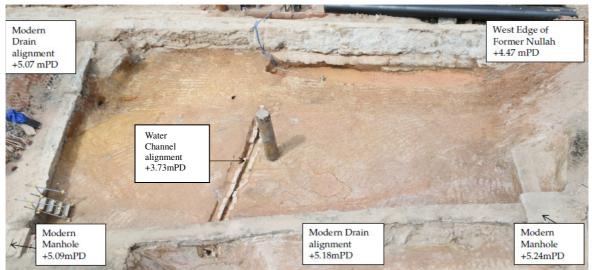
Modern manholes and modern drain unearthed in fill soil layer within TP10
